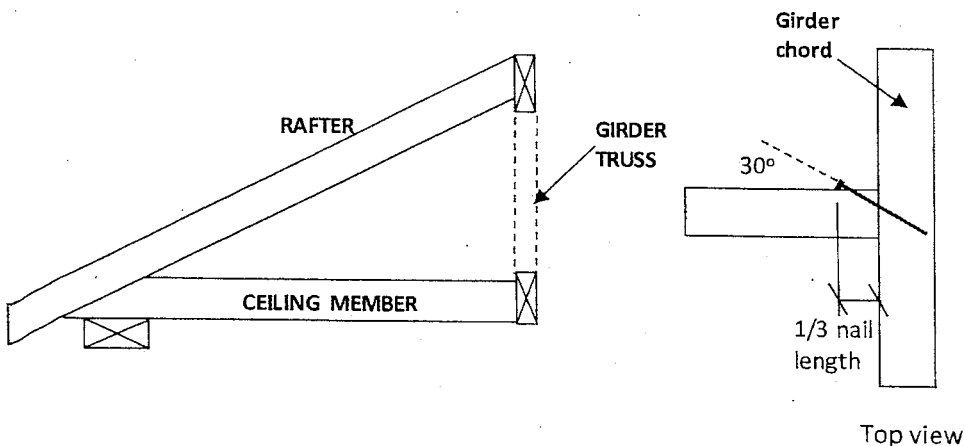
Toe-Nailing Rafter / Ceiling Member to Girder Truss
